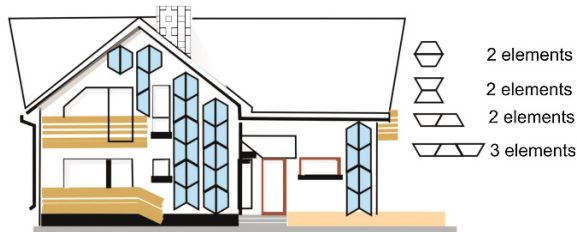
Vertically disposed array units with trapeze elements on the façade of a residential house
